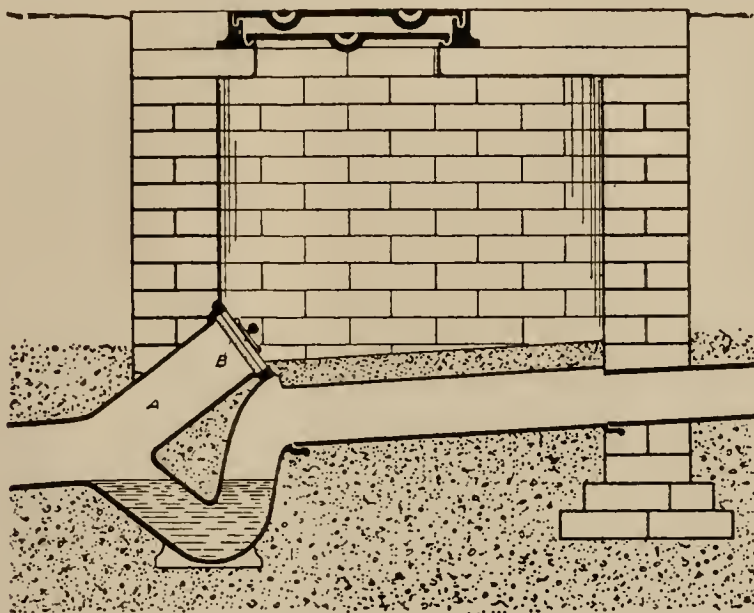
INSPECTION CHAMBER FOR TRAP BETWEEN SEWER AND DRAIN.
